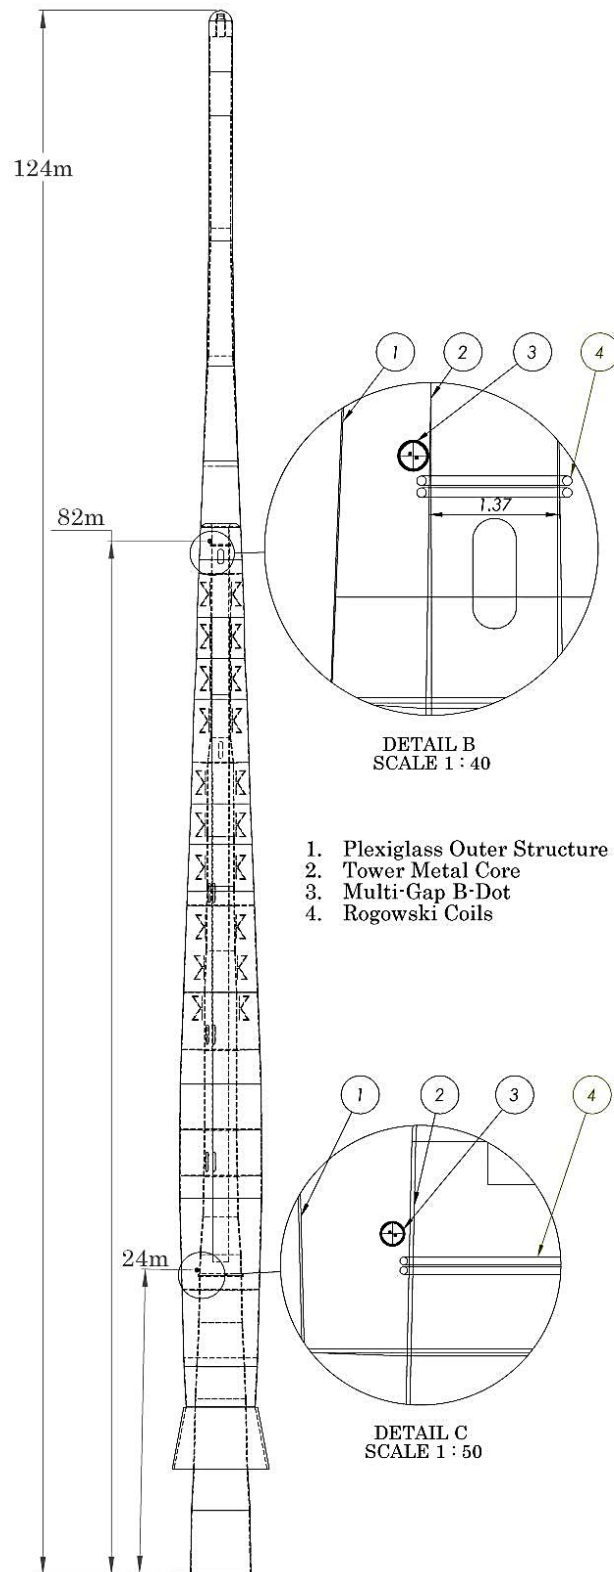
Sántis Tower CAD drawing, detailing the inner metallic core and the outer Plexiglas structure, the sensors placement and the overall tower dimensions. The scale of the details drawing refers to the scale of the main drawing.
